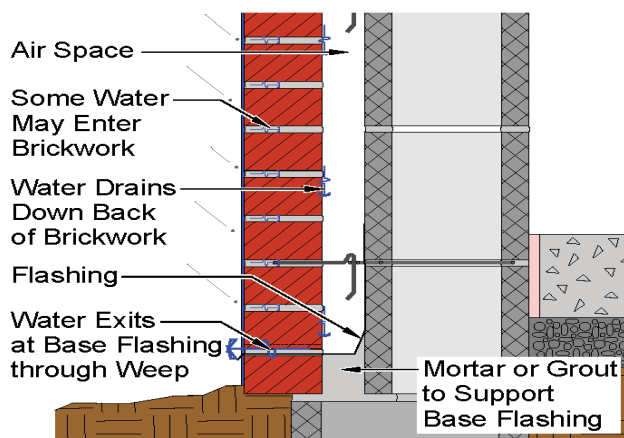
Drainage Wall Systems. BIA recommends the use of drainage wall systems, as shown above. BIA does *not* recommend the barrier strategy of filling a collar joint between masonry wythes because it places a source of salts in direct contact with the brickwork.
